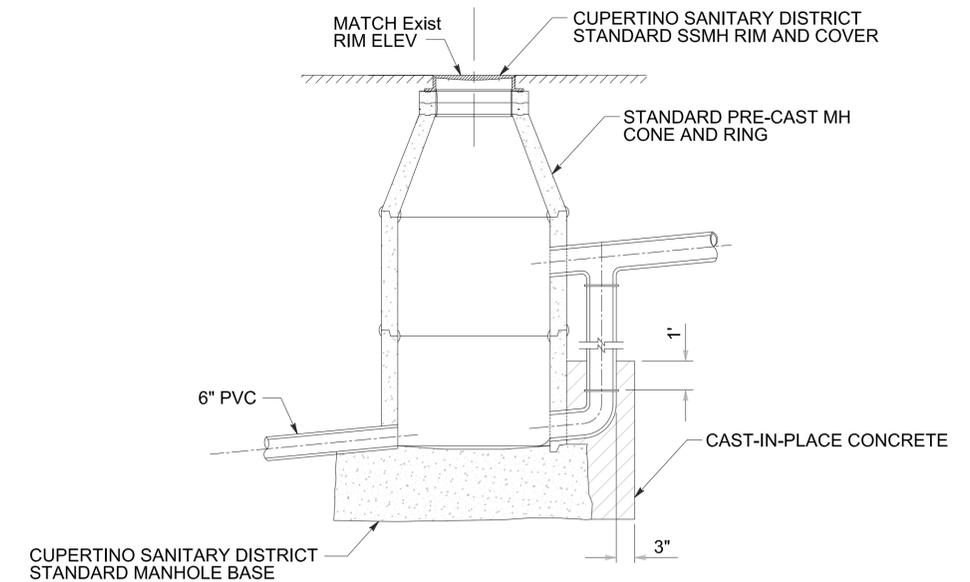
DETAIL A - SS LATERAL OVER STORM DRAIN PIPE
